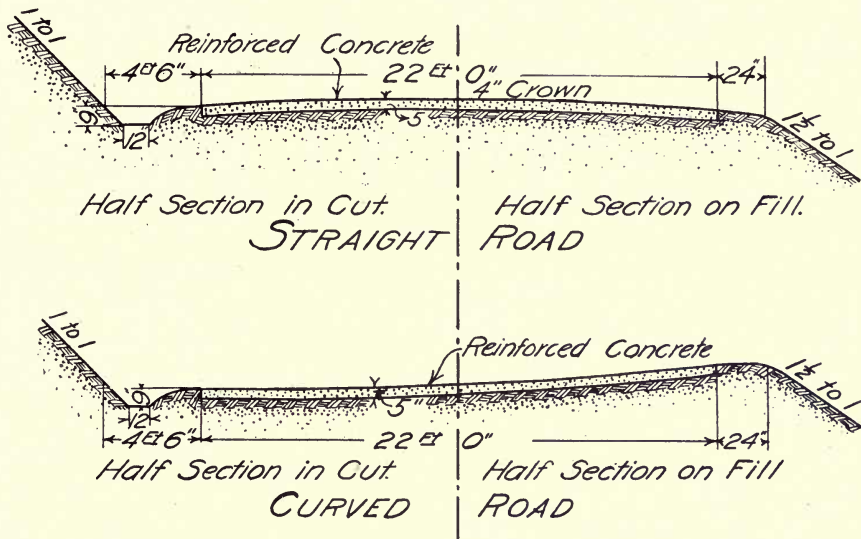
TYPICAL CROSS SECTION OF LONG ISLAND MOTOR PARKWAY.
